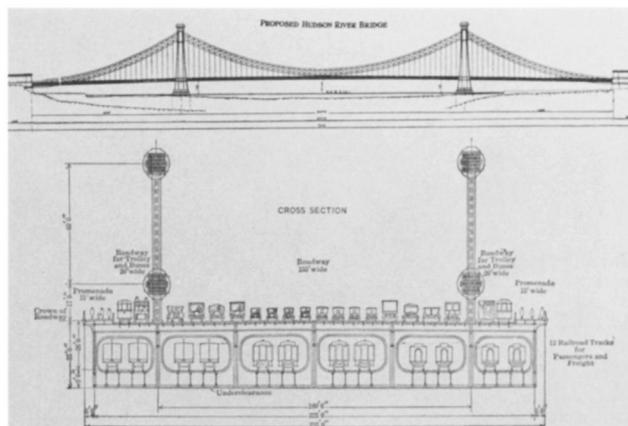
Hudson River, proposed suspension bridge, G. Lindenthal, 1921. Elevation and section (Steinmann, *Suspension Bridges*, 1929).
